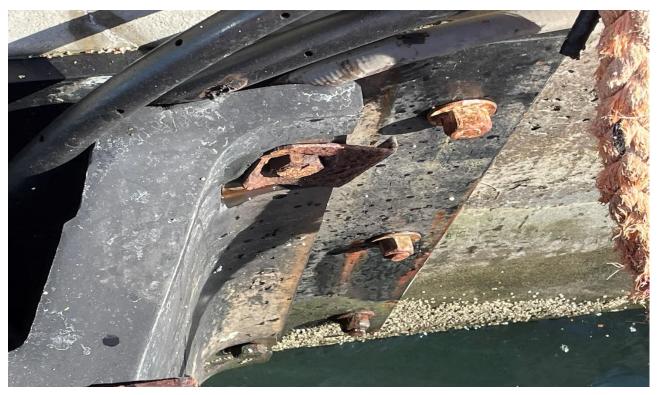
Bolts connecting rubber fender to mounting plate & threaded rods connecting mounting plate to seawall are corroded at Pile P40.
